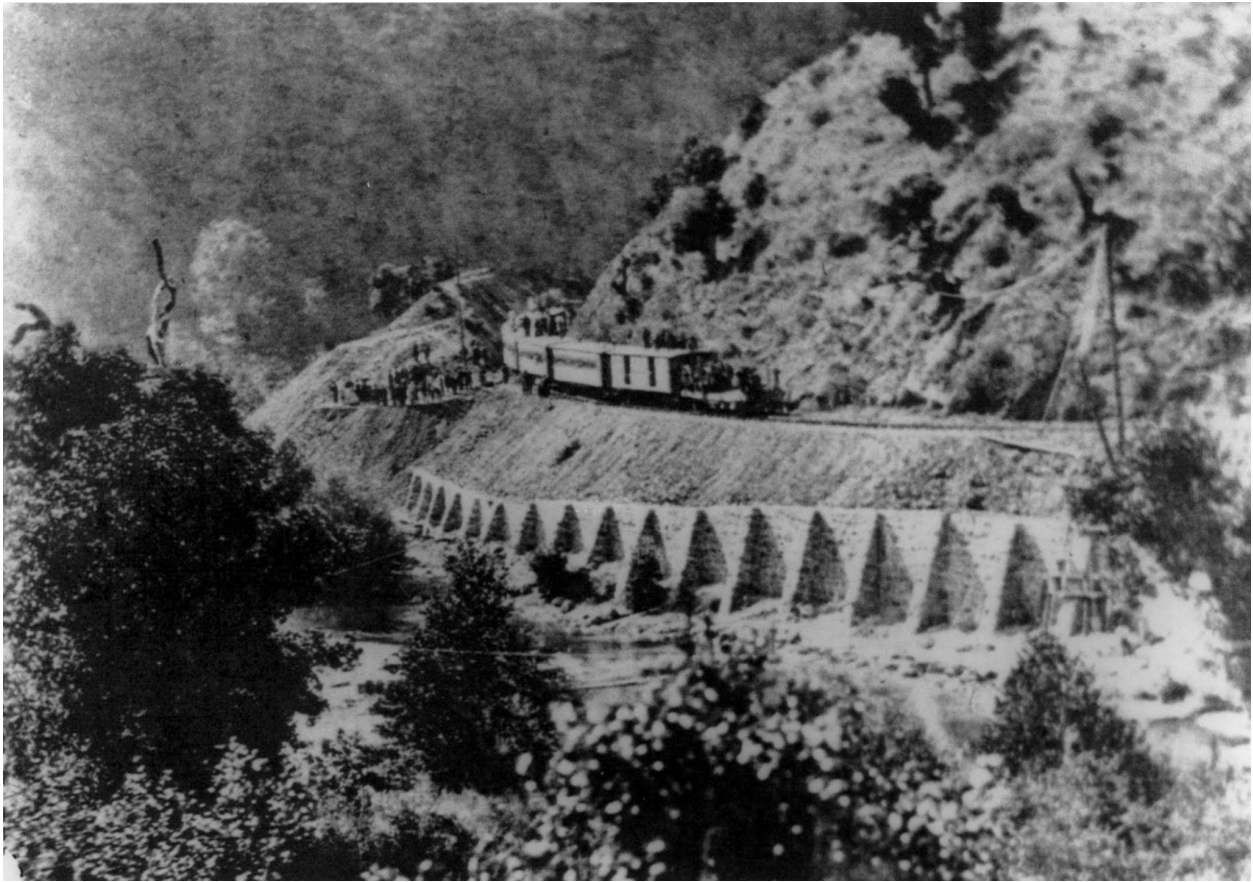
“Some of the embankments are over fifty feet in height, and are retained at the bottom by huge walls of solid masonry.” The Cox gang built this large dry-laid buttressed stone retaining wall near MP 32.7 from locally quarried coursed sandstone. It is still in use, although it is covered with fill and overgrown vegetation. The train was one of the first trains in the Cañon and its occupants are inspecting the retaining wall. Note that the train backed up into the Cañon.
